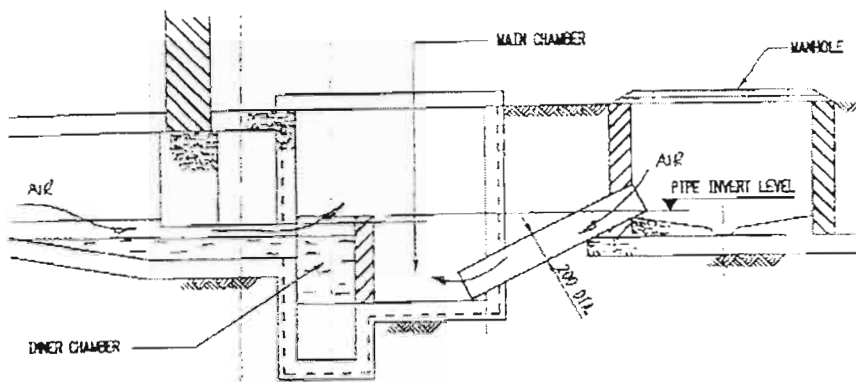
Design drawing of Tugela Test Station showing the side elevation
